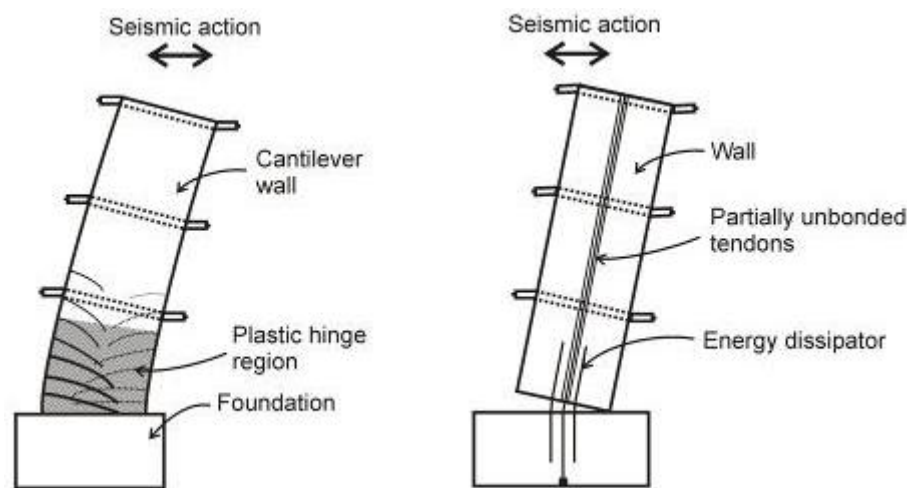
Comparison of monolithic wall and jointed precast rocking wall (after fib, 2003).
